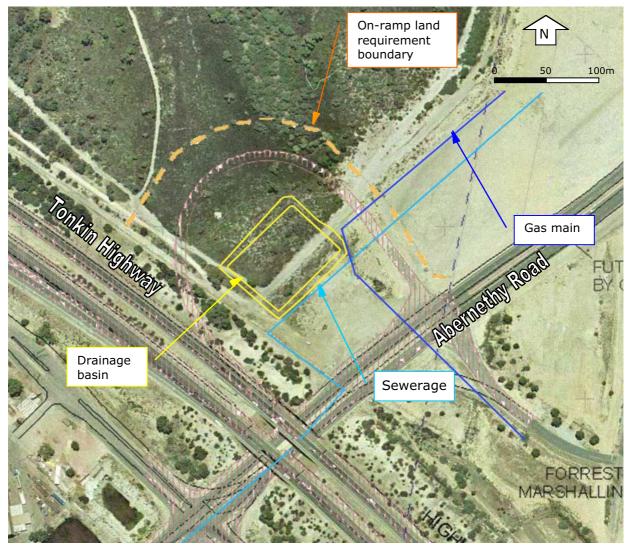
Aerial photography of the proposed site for the on-ramp showing land requirement, drainage basin and existing constraints.
